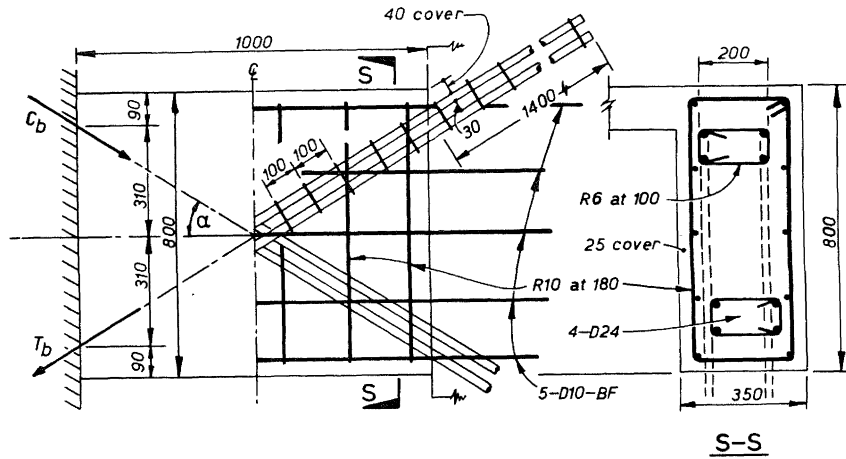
DETAILS OF A TYPICAL DUCTILE COUPLING BEAM
